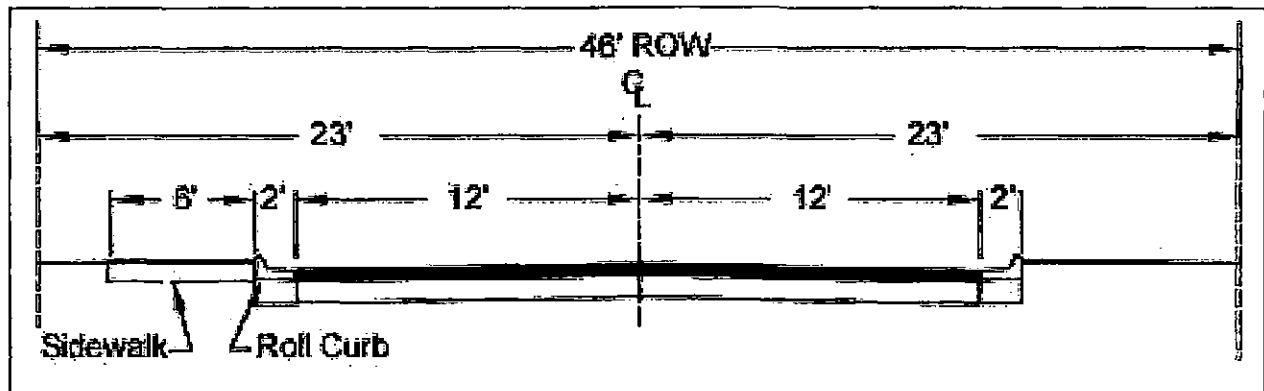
DS&PM FIGURE 5.3-20 (Suburban Local) Proposed Internal Private Local Street Cross Section
